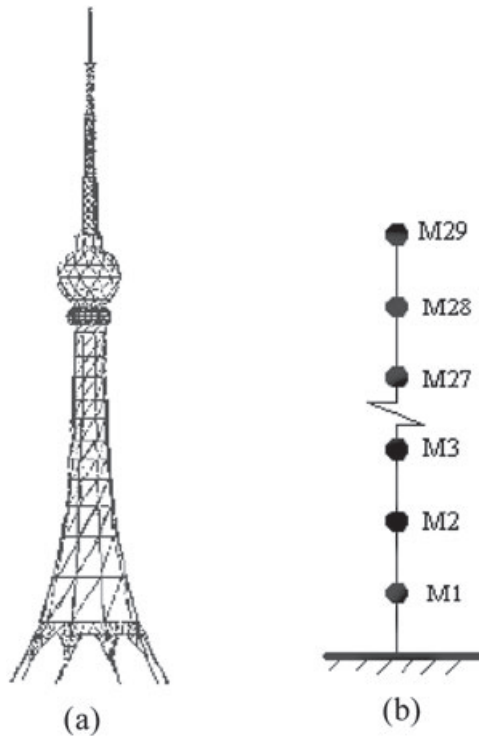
TV tower model used as structure 'C'. (a) Tower Structure, (b) Lumped mass system
